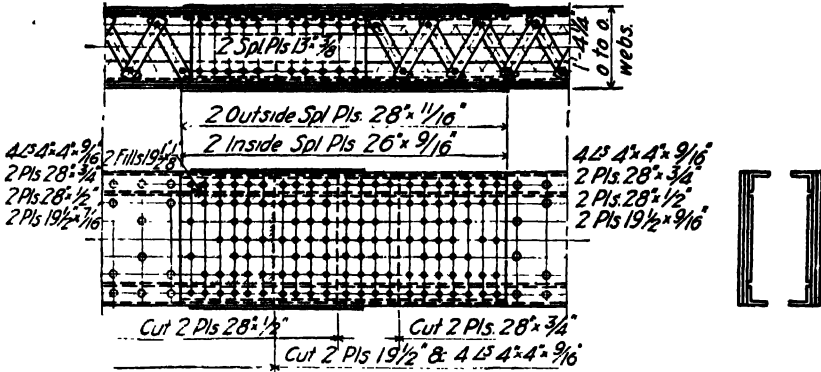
gg. Tension Lap-splice in Panel  $L_3L_4$  of the 271-foot Spans of the Great Northern Railway Co.'s Bridge over the Yellowstone River.
